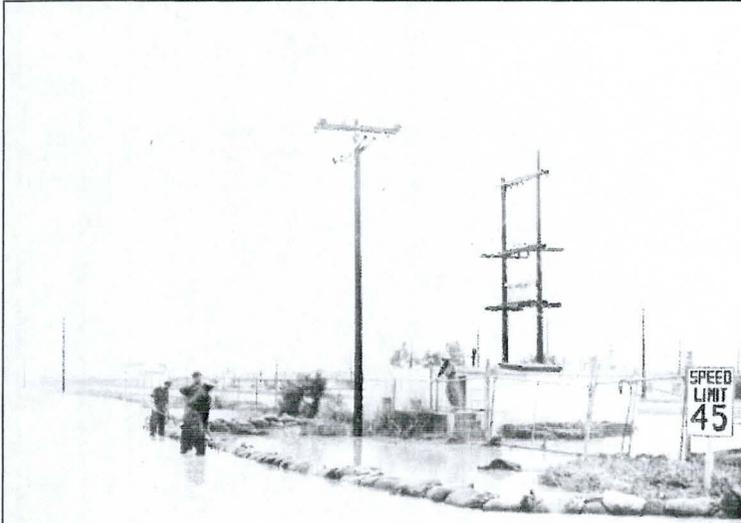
Luke AFB - Sand bagging to keep flood water out of pumping plant - 1951
